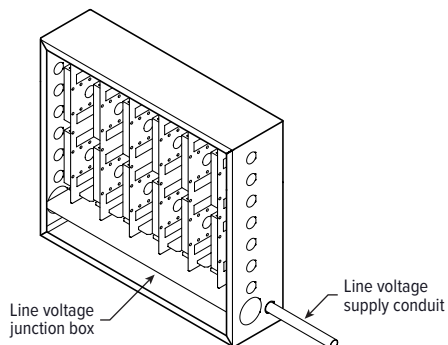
RDB1 Remote driver enclosure for single fixture
